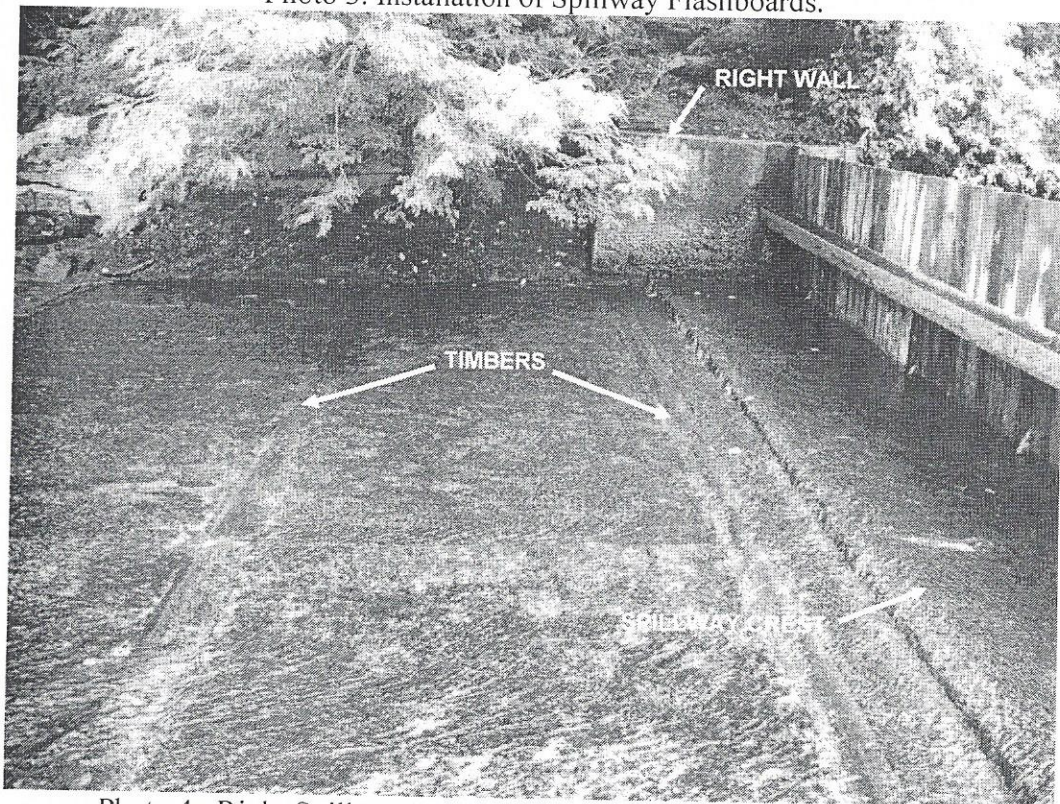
Right Spillway Bay Crest, Apron and Right Abutment Wall.
